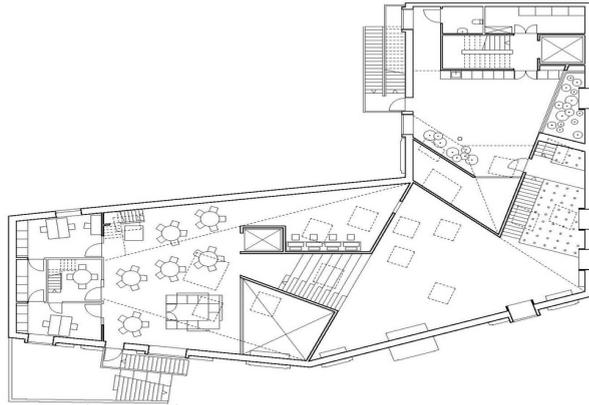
| First Floor | Dorte Mandrup Arkitekter
